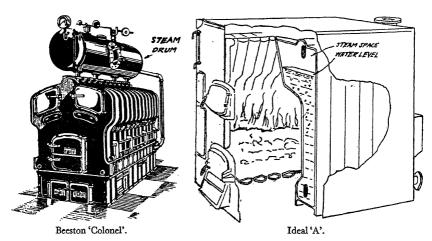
Low-Pressure Cast Iron Steam Boilers.
